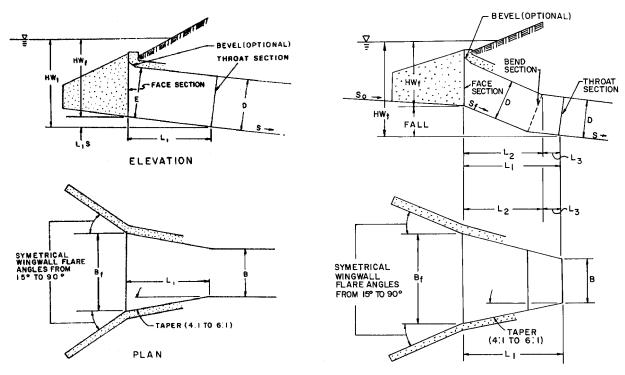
Side-Tapered and Slope-Tapered Improved Inlets
